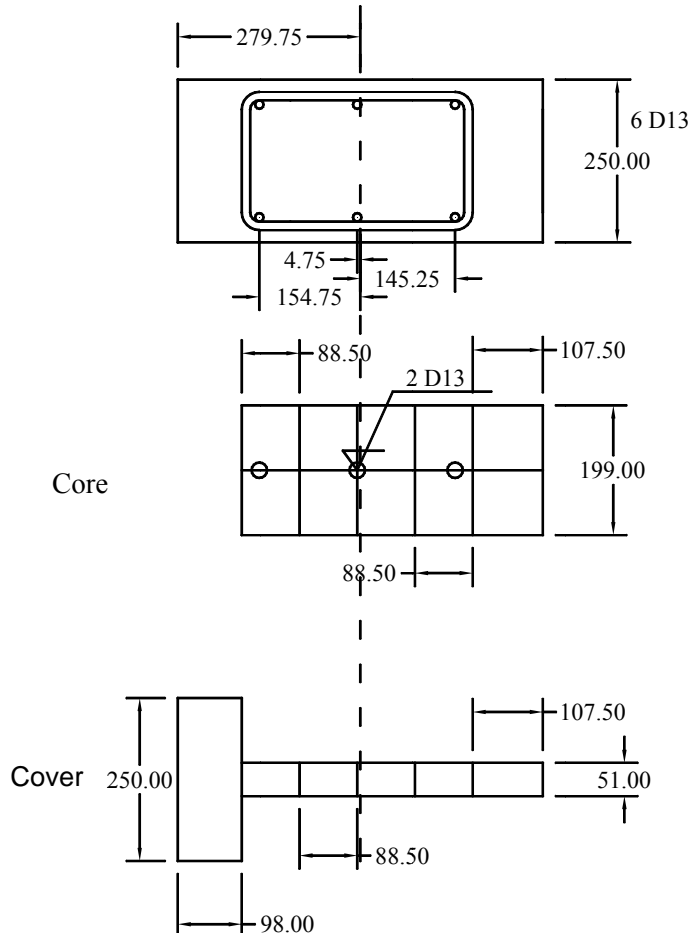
Second-story boundary element cross section (Units: mm)
